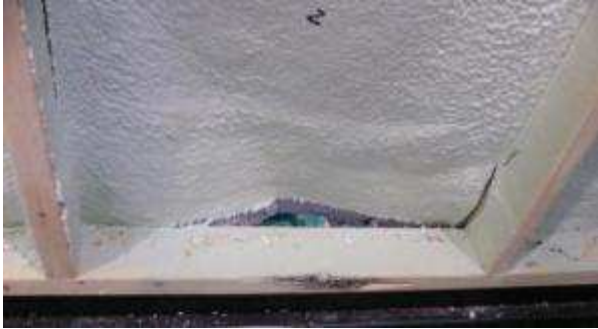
Fastener withdrawal failure (Specimen R)
